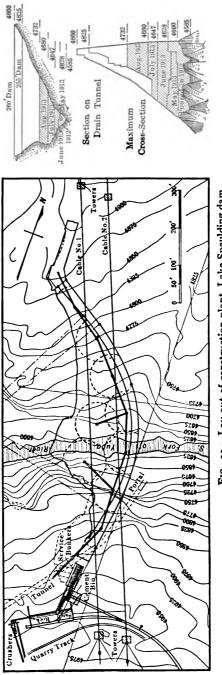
Lay-out of construction plant, Lake Spaulding dam.
